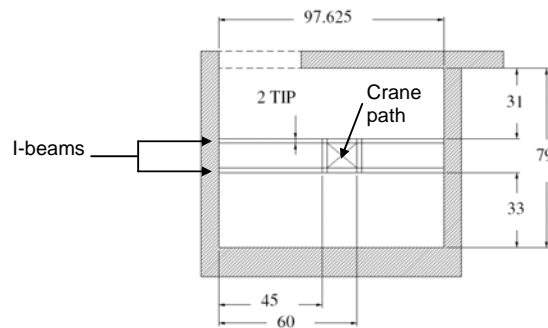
Tower Lab main dimensions from 2nd to 10th floor
